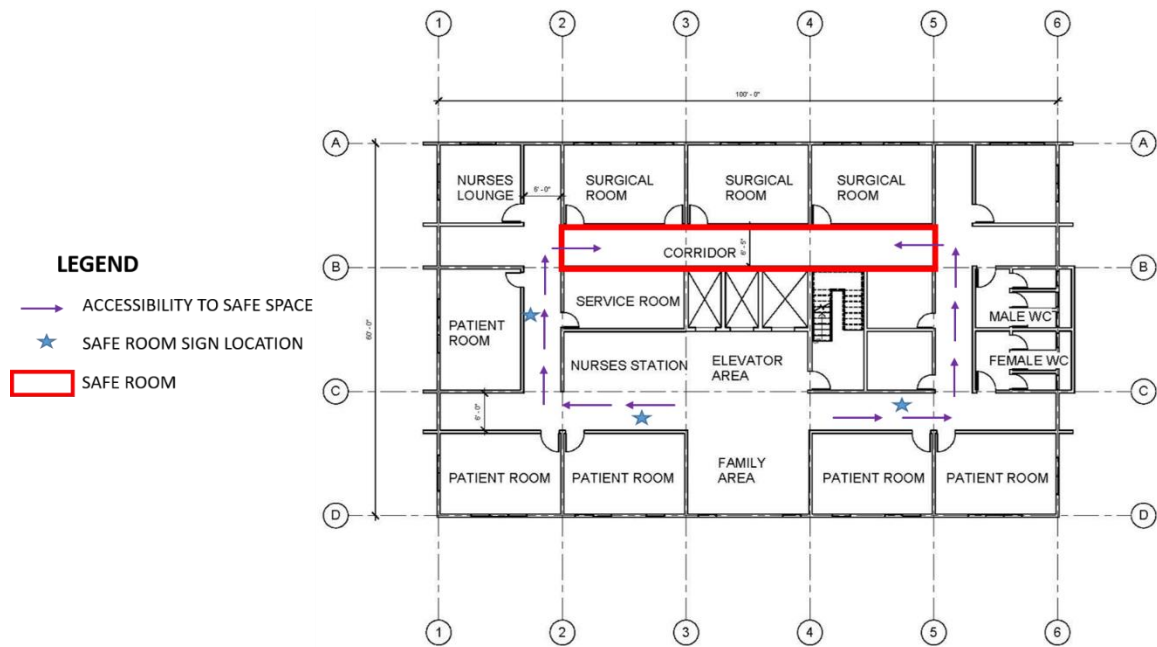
5: Plan showing accessibility to safe space (Ampaw-Asiedu & Norton, 2017).
